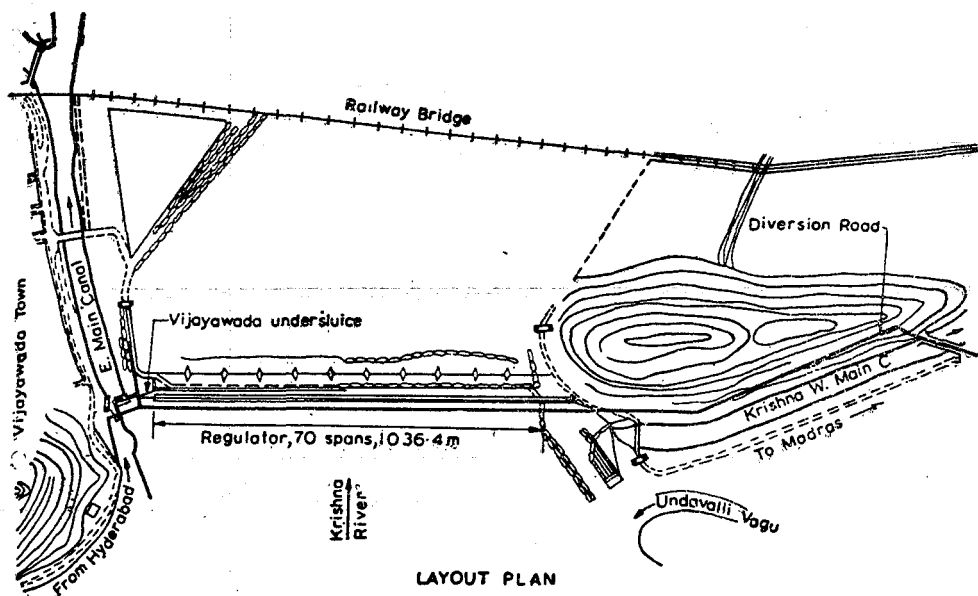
(b) Layout plan of Prakasm Barrage.
